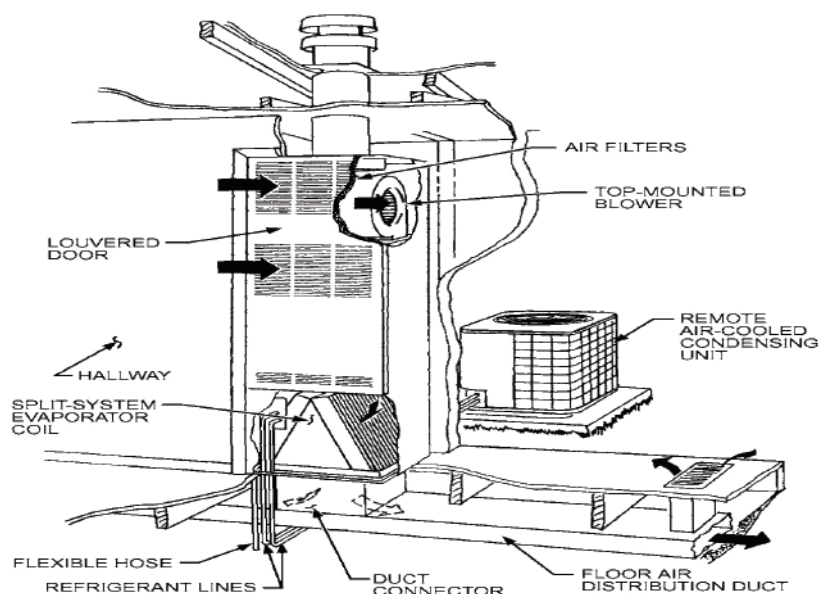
Typical Installation of Heating and Cooling Equipment for Manufactured Home
